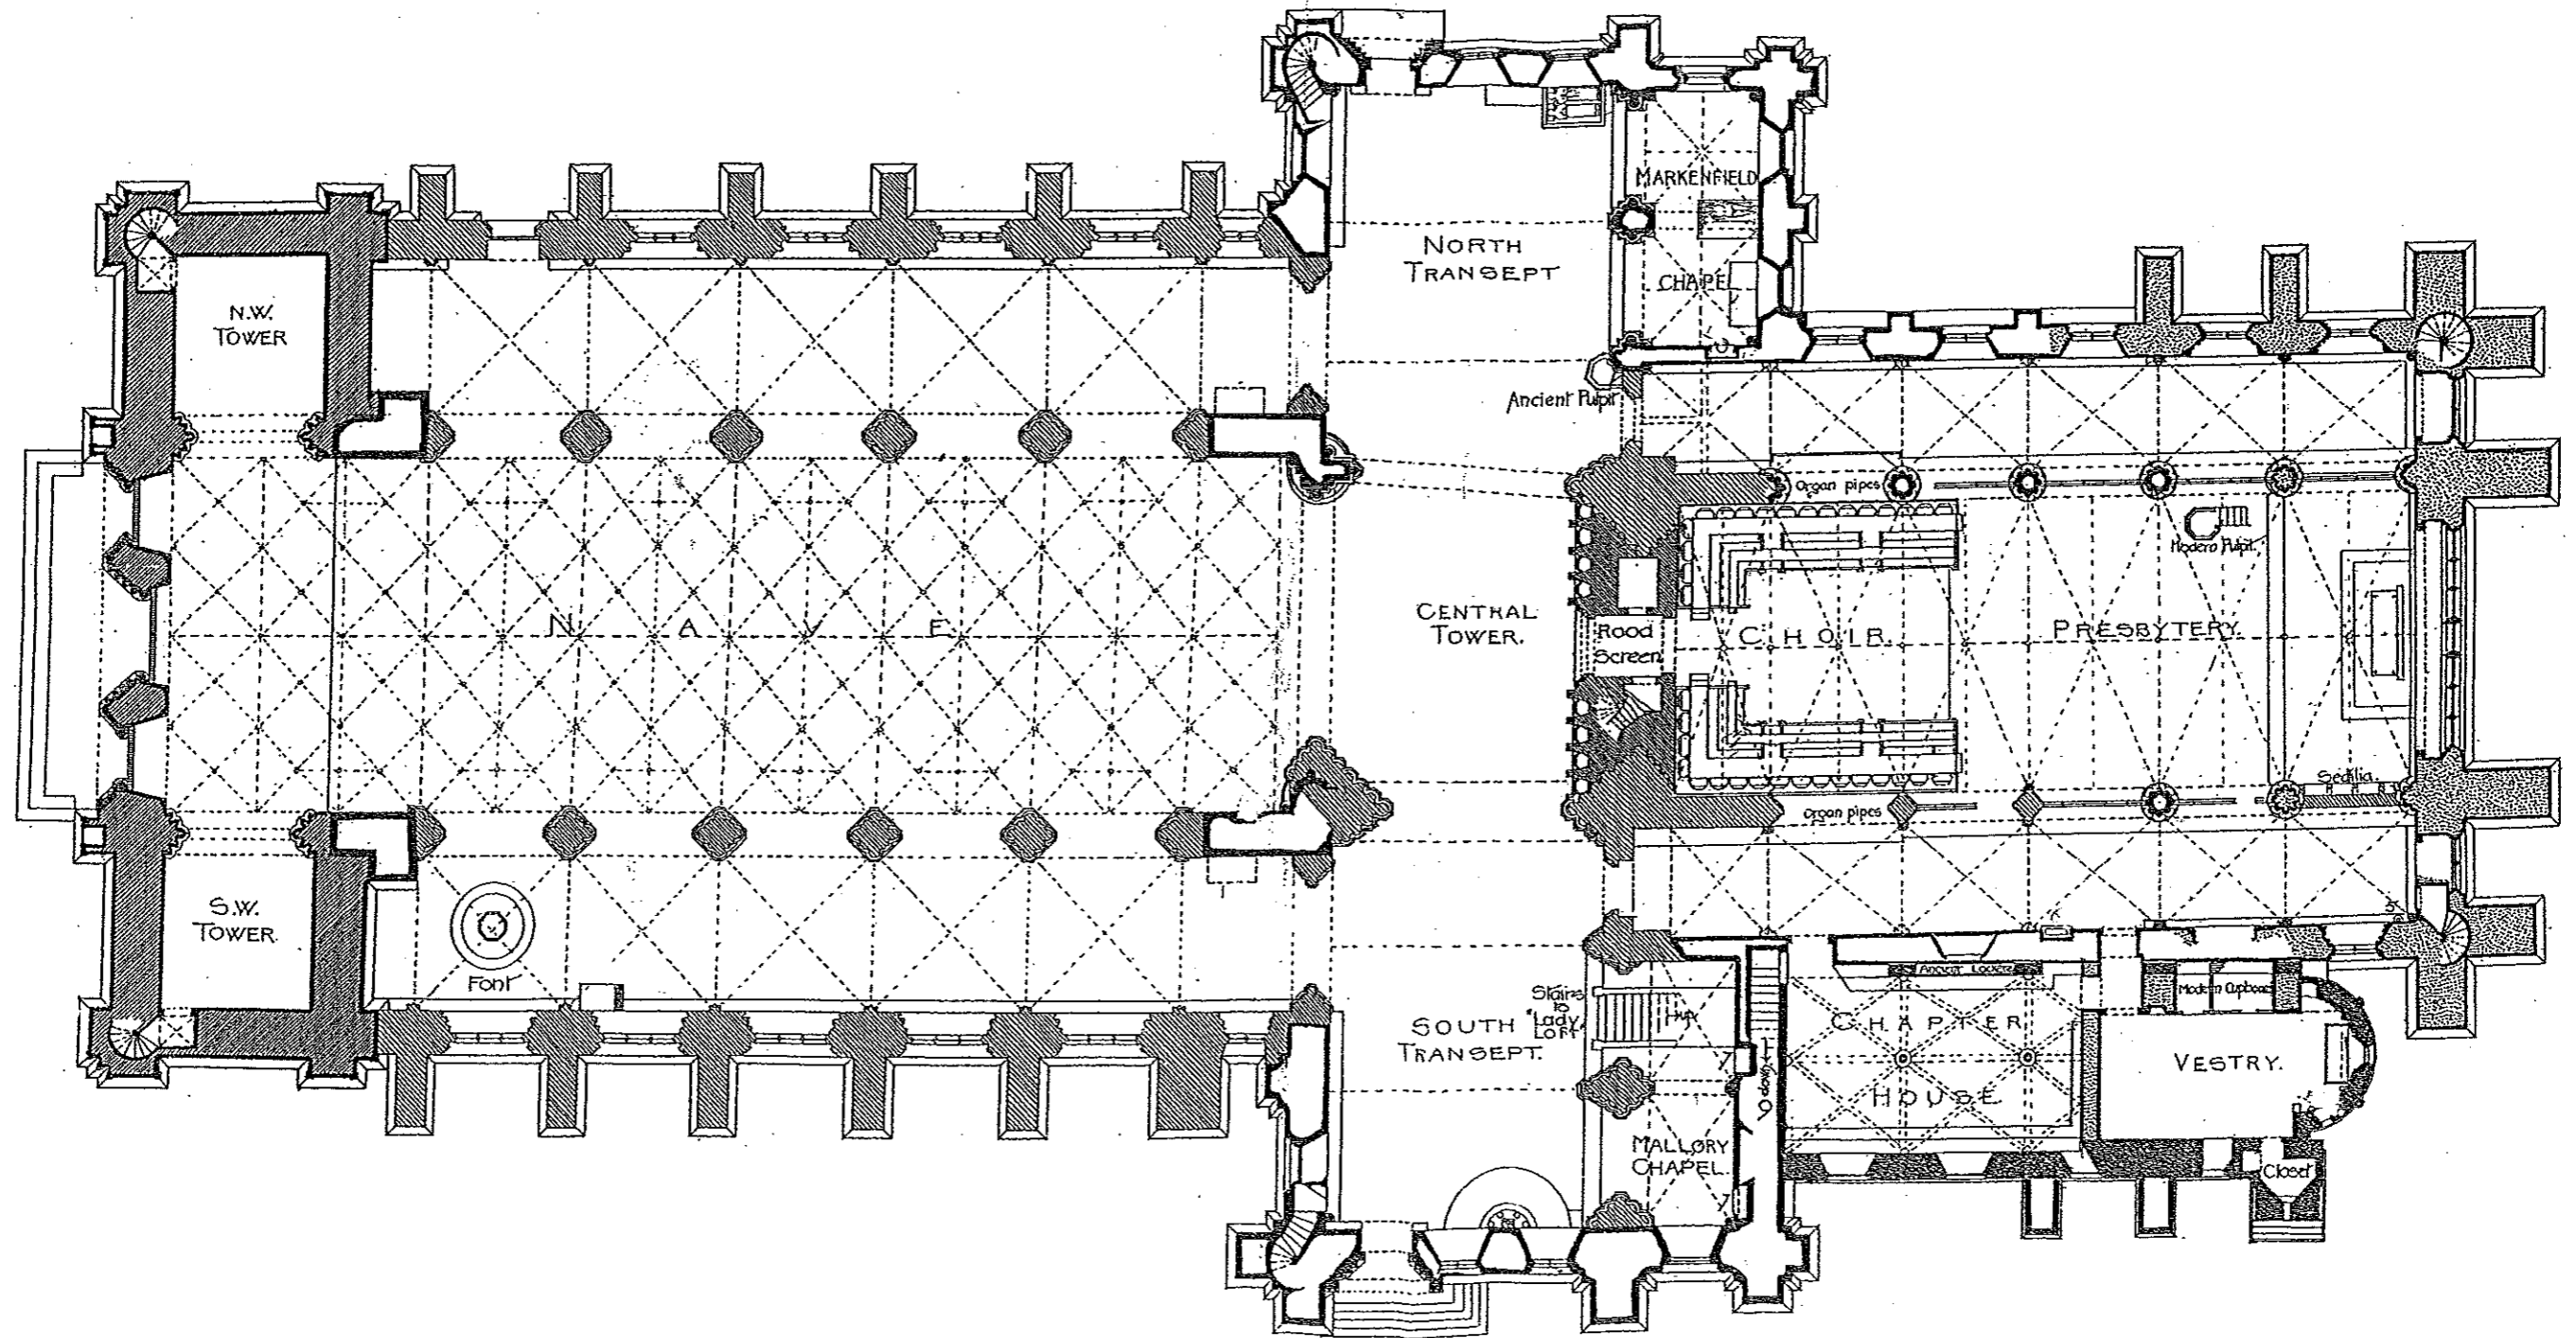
Plan to show position of sampled timbers from the nave roof of Ripon Cathedral © NMR 93/7827
